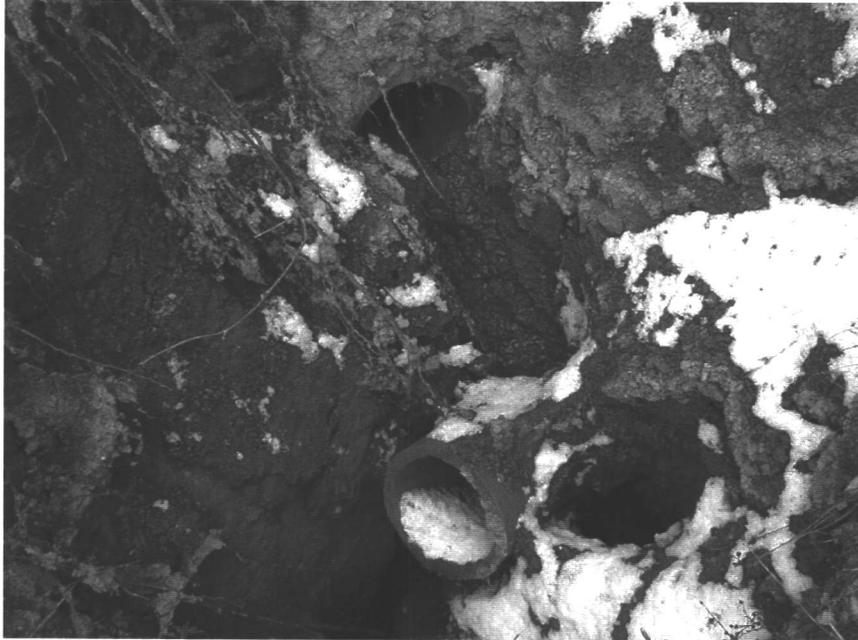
Clay Drainage Tile- March, 2006 (Photo taken by MTO)
